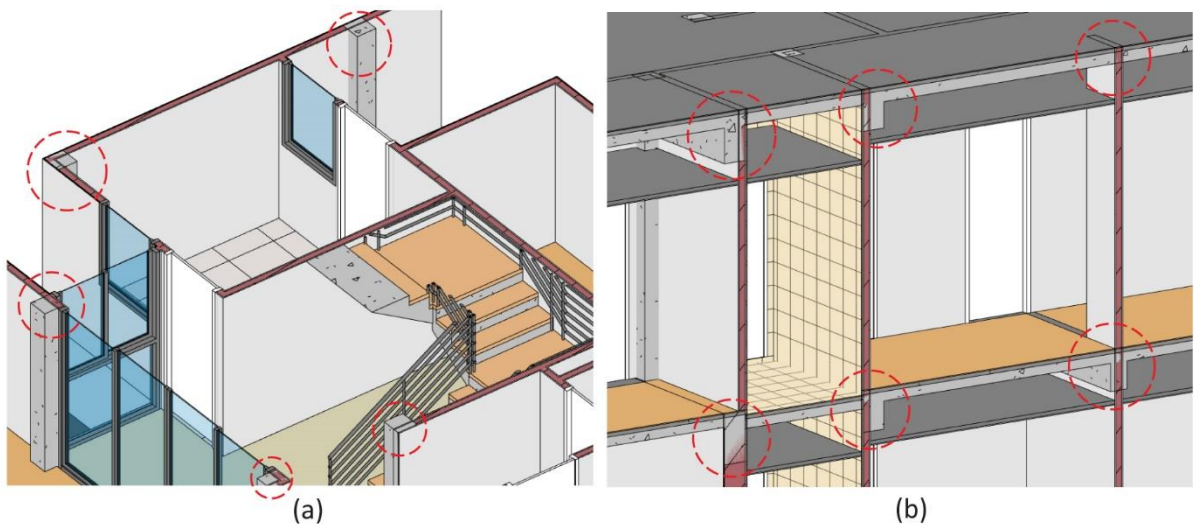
(a) Walls were created to overlap with columns. (b) Walls were created to overlap with beams and floors
